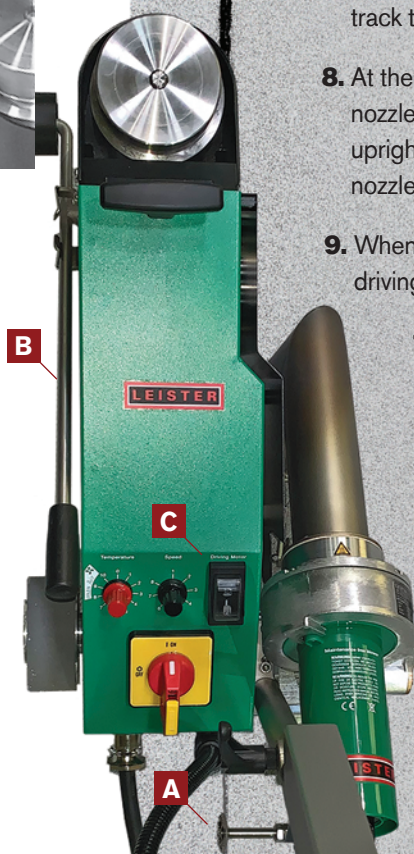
Lifting device handle engaged; pressure/drive wheel raised off membrane
